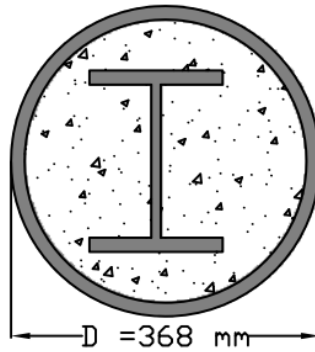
Steel reinforced concrete filled steel tube cross section
